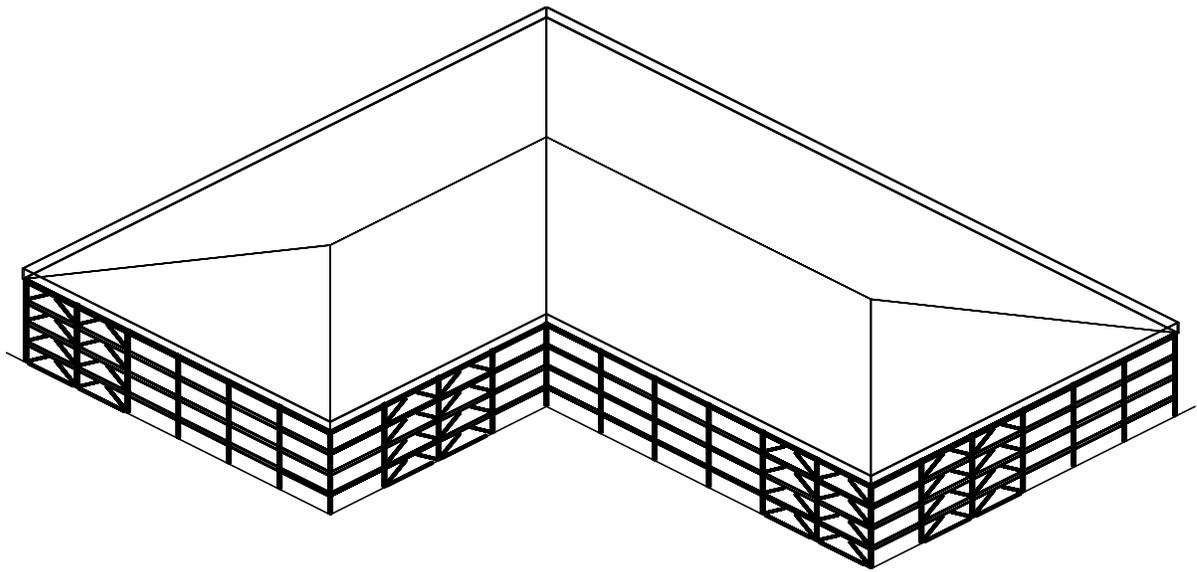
C-1. Four-story steel frame office building with chevron braced frames
